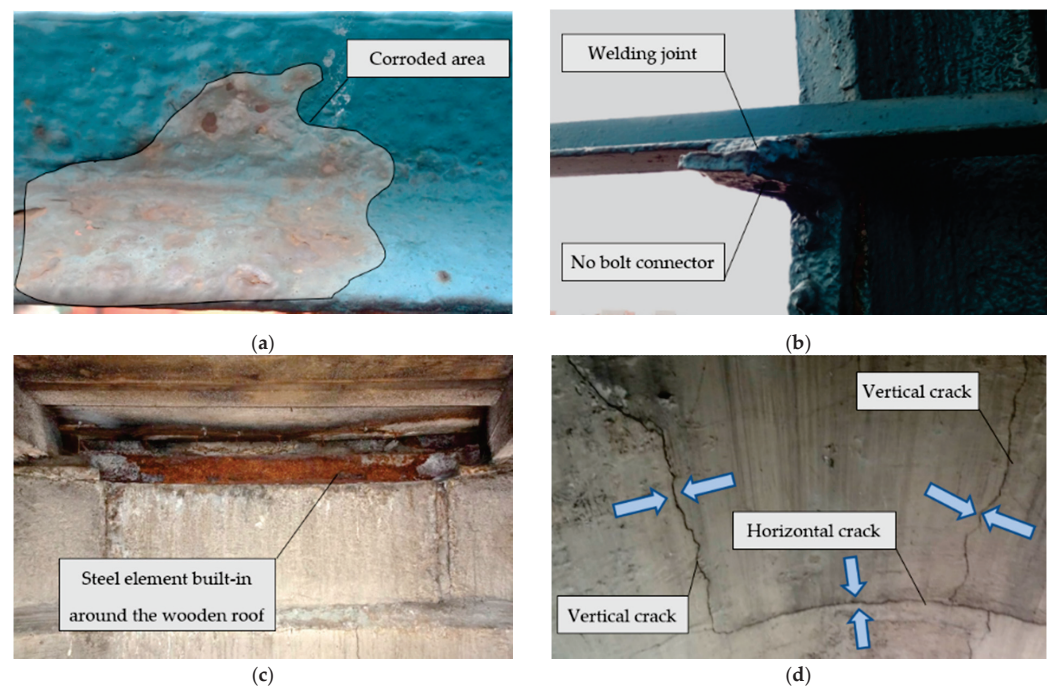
Technical problems negatively impact the structure's technical condition. (a) Corrosion of the $L45 \times 45$ angle, and visible bursting of the painted surface with corrosion products; (b) support for the $L45 \times 45$ angle section at the connection with the rib; (c) corrosion of steel profile around the flat wooden roof; (d) cracks in the masonry structure below the flat wooden roof, and vertical and horizontal damages; *the arrows indicate cracks.
